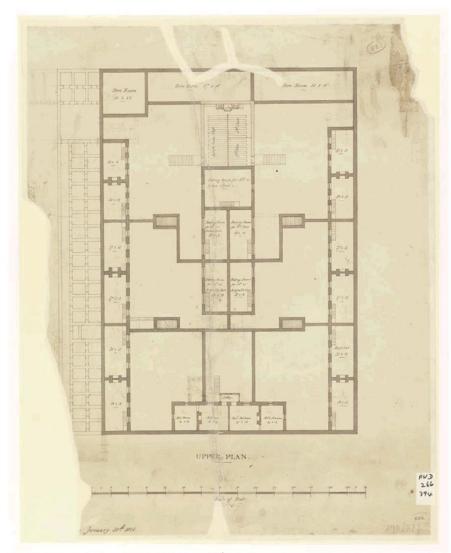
Original floor plan of Yard 1 dated January  $30^{th}$  1828. Source: Tasmanian Archive and Heritage Office, PWD2661394
